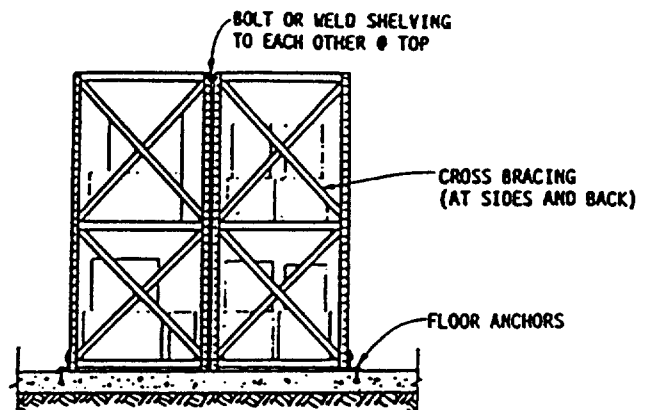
Approaches for Anchoring Storage Racks (Figure 4-67 of Reference 60)
